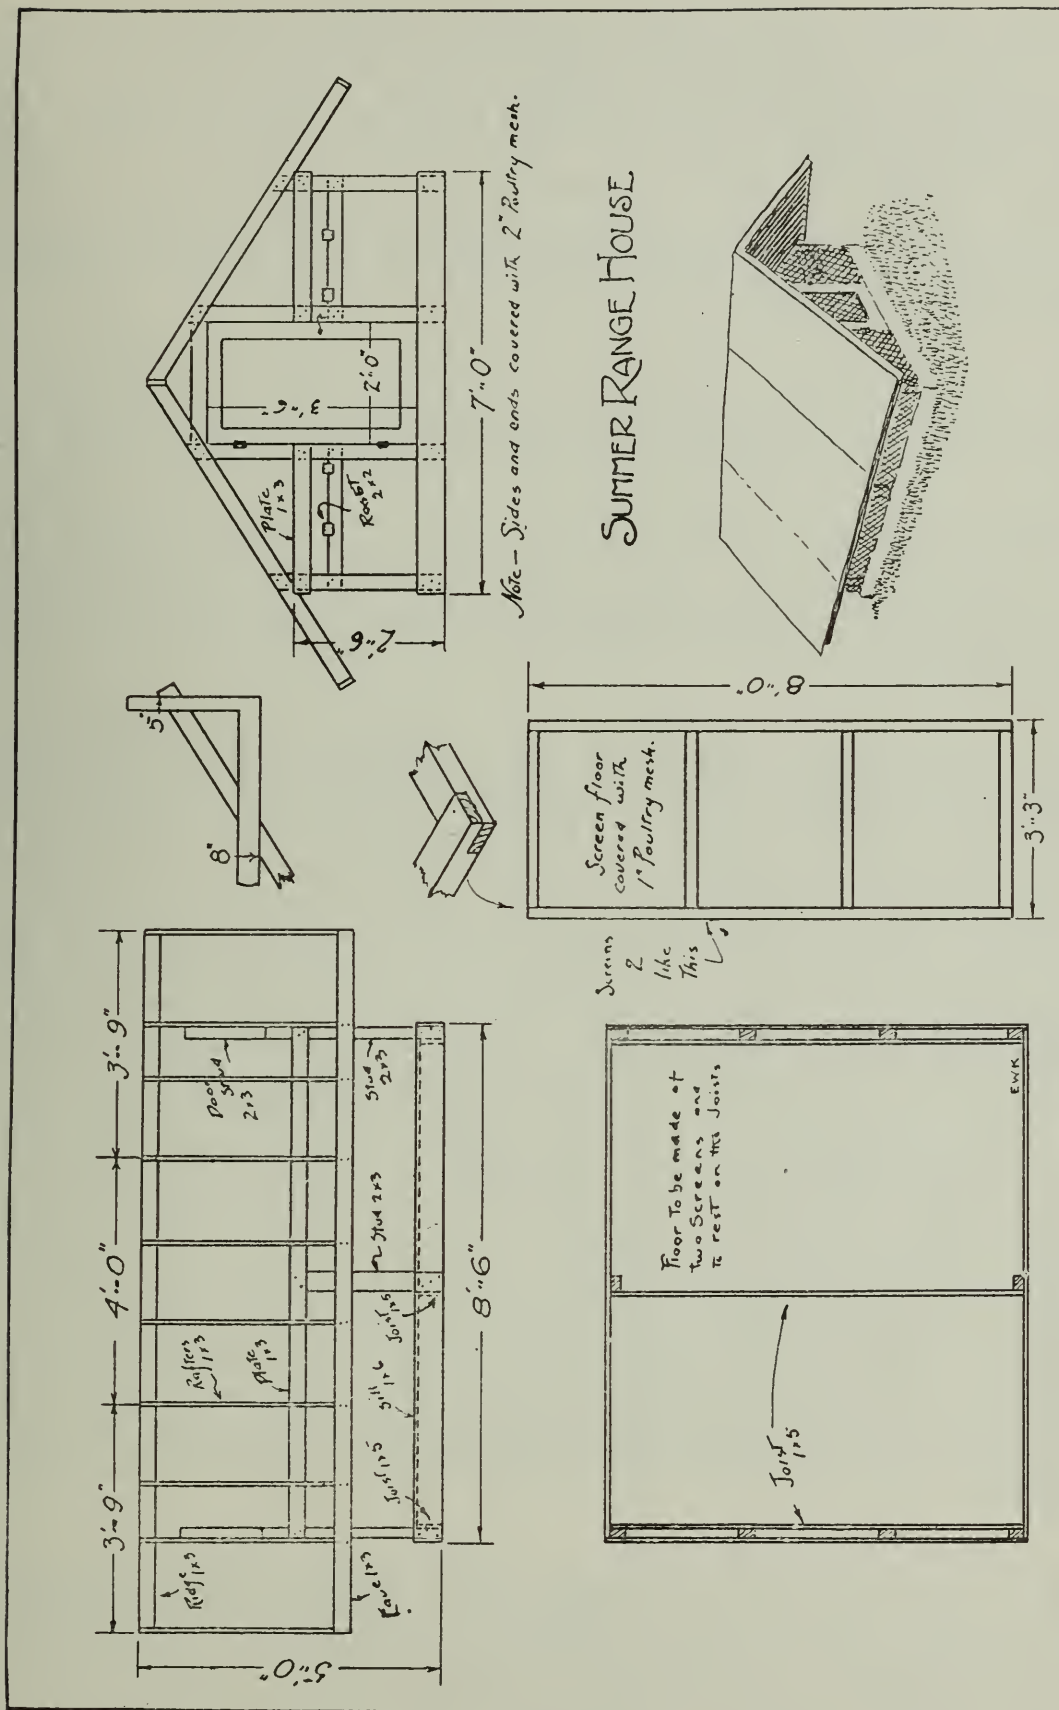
Plans and construction detail for Range Shelter shown in Fig. 63.
